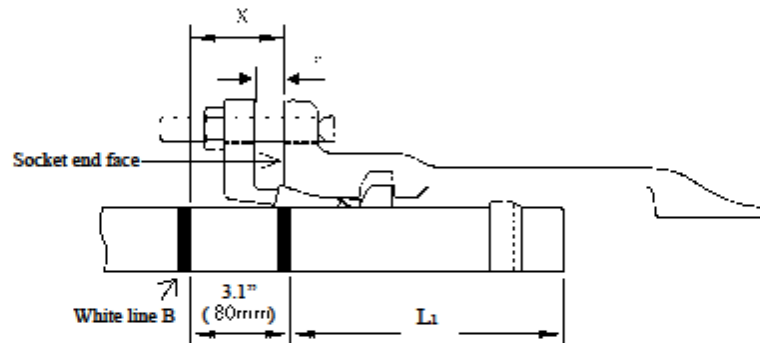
Measurement of clearance between socket end face and gland, and clearance between socket end face and white line
